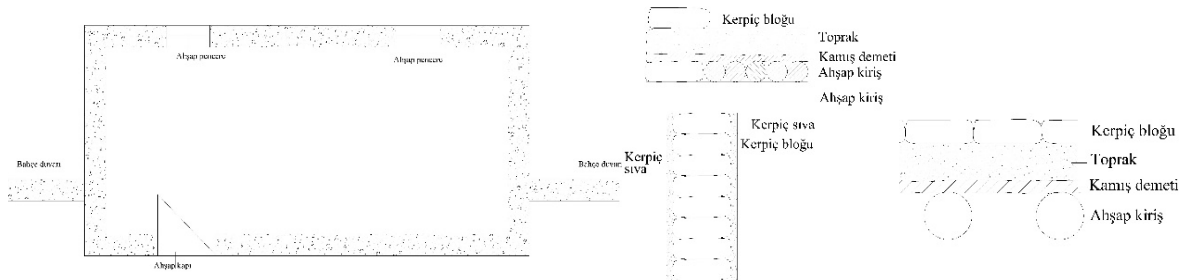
Vernacular earthen building plan, section, and detail drawing in Sindelhöyük, 2023.
